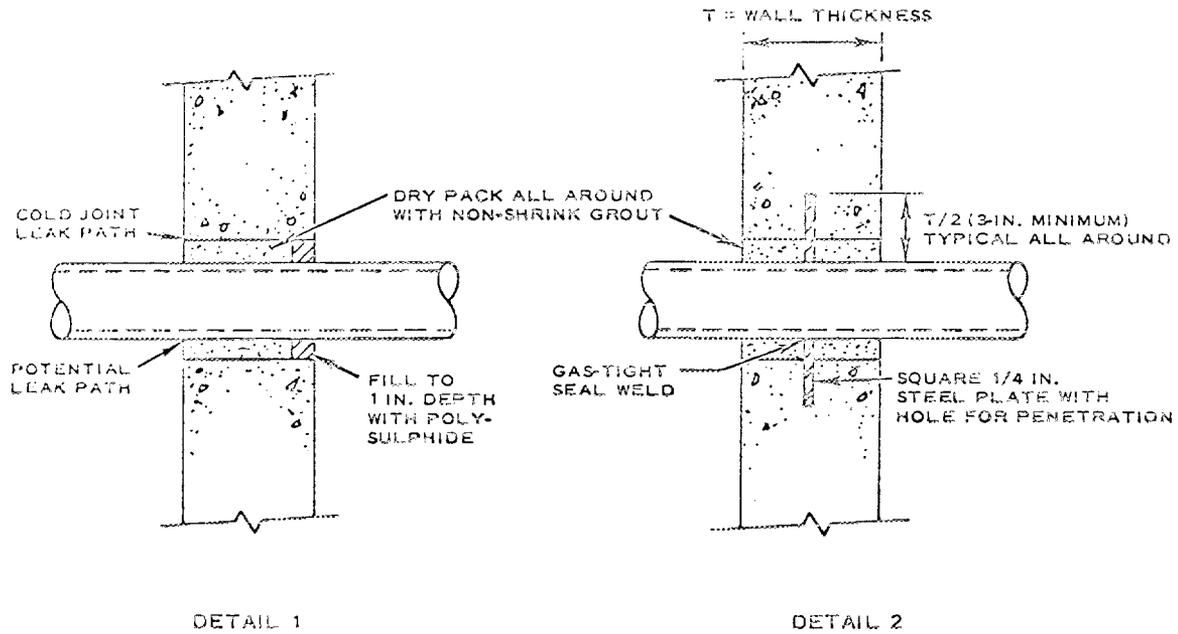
Piping Penetrations Cast in Concrete Wall. (From ref. 2)
